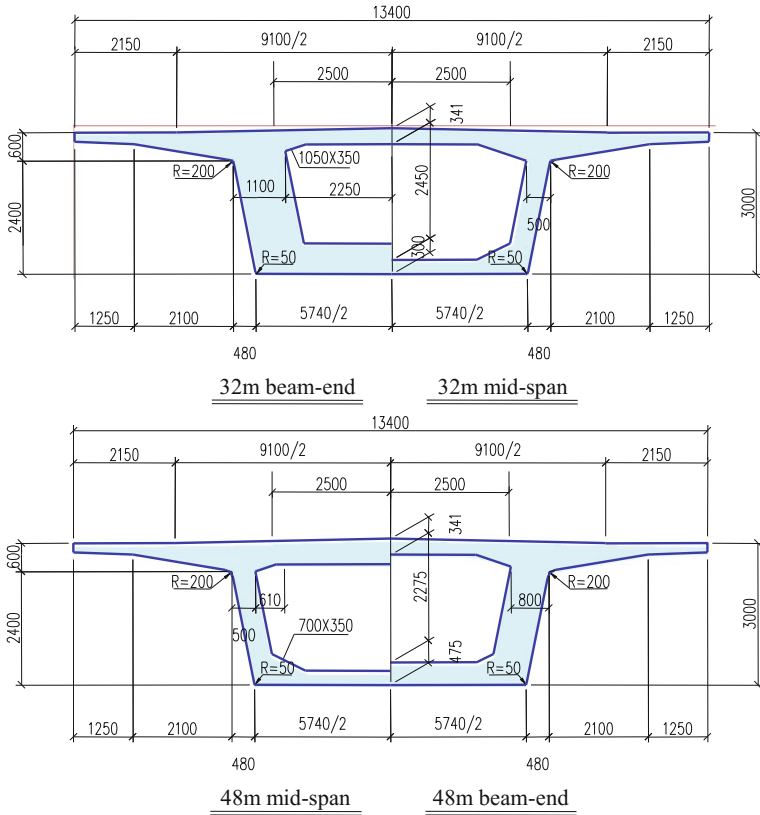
Cross sections of the (32+48+32) m continuous bridge (unit: mm)
